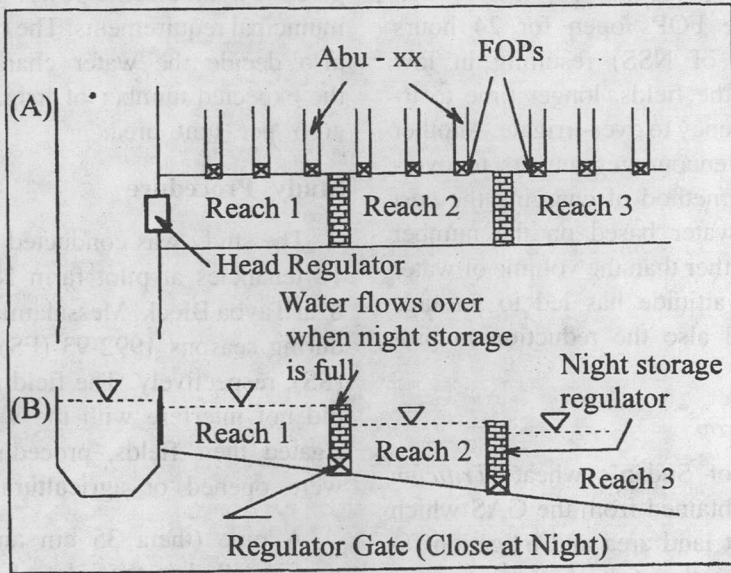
Schematic drawing of the minor canal showing the night storage system (NSS): a) plane view, and b) side view.
